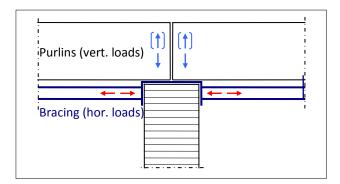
Separation of load bearing structure for horizontal and vertical loads, enabling detachment in case of Failure
